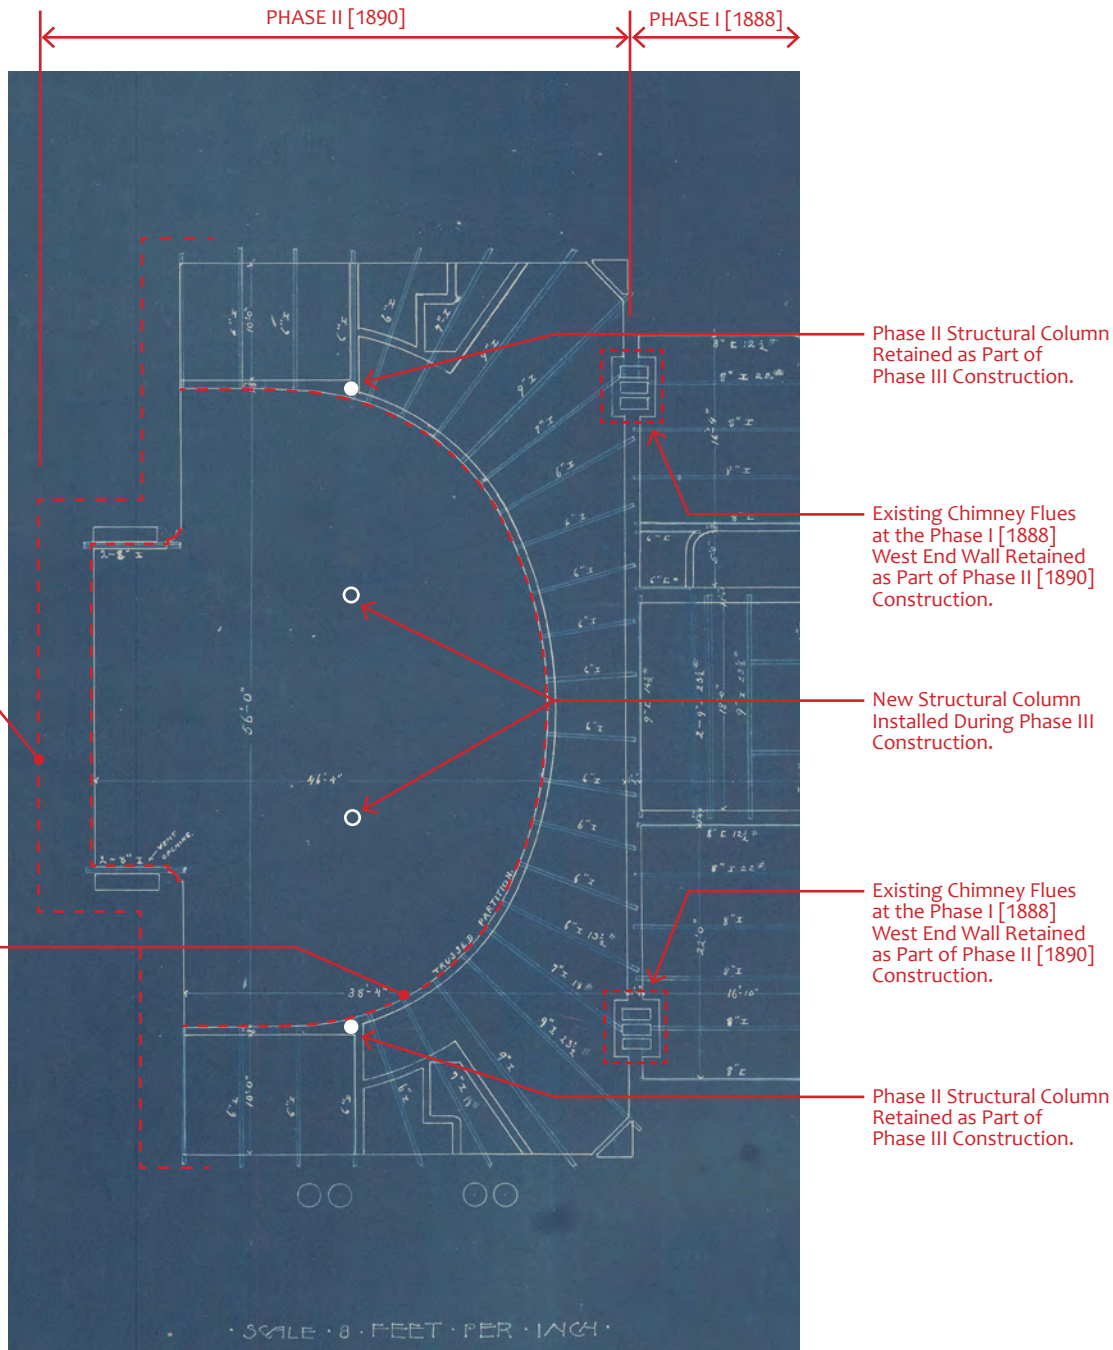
Phase II Third Floor Plan Framing Plan [West], Illustrating the Phase II Senate Chamber.
